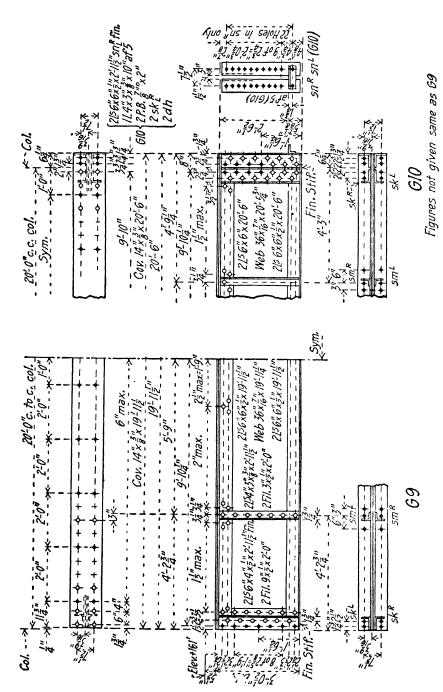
DETAILS OF CRANE GIRDERS. AMERICAN BRIDGE COMPANY.
